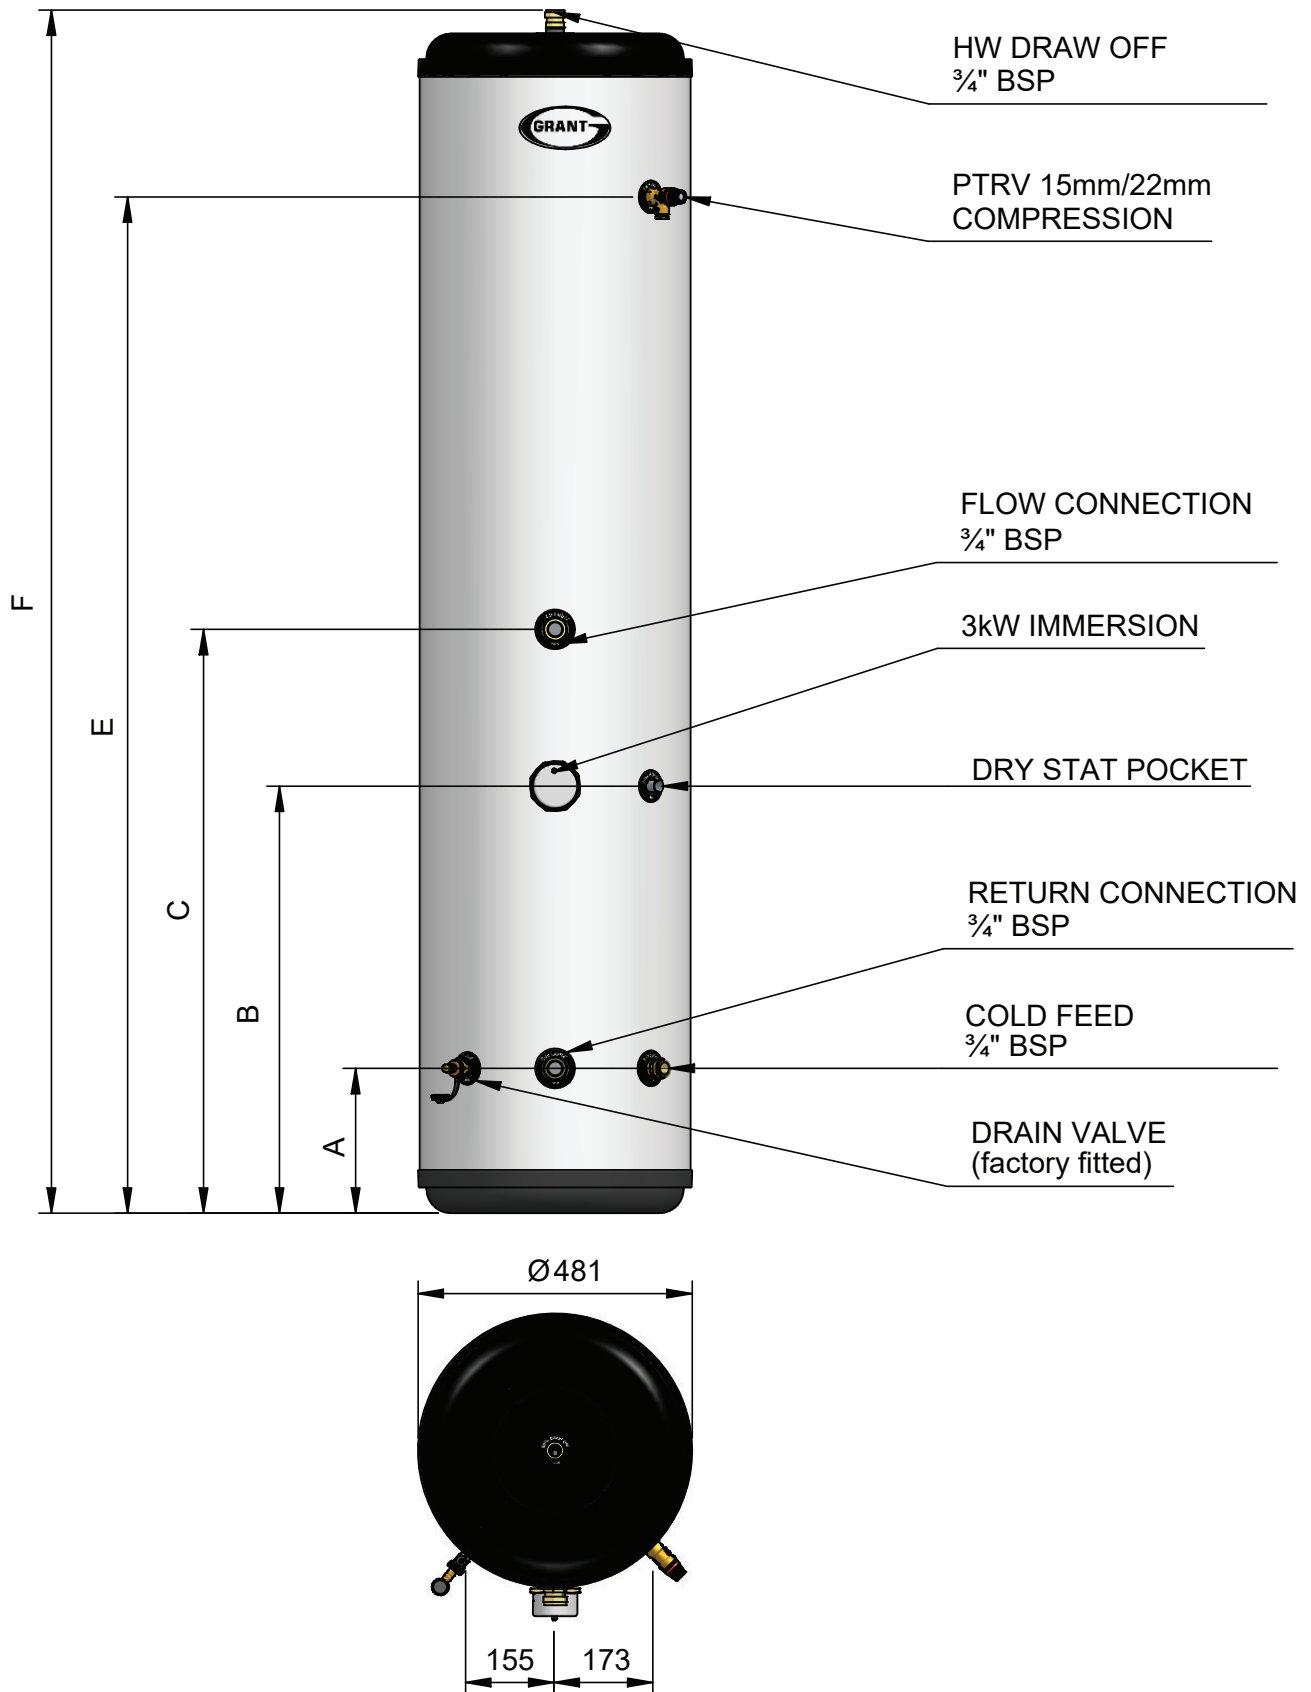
Grant Slimline QR single coil Heat Pump cylinder dimensions
